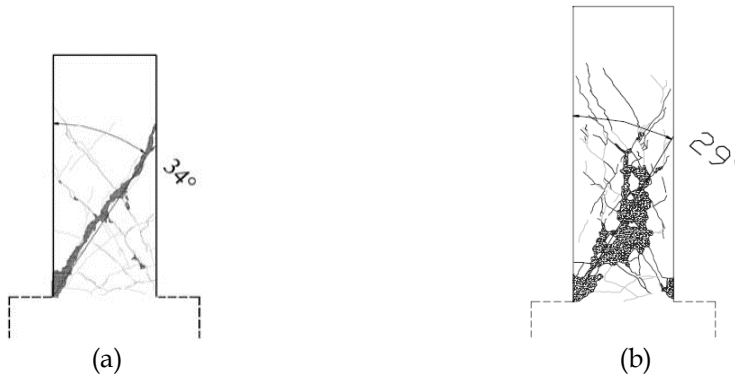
Typical final crack patterns for S-specimens (a) and T-specimens, Calvi et al. (2002)
